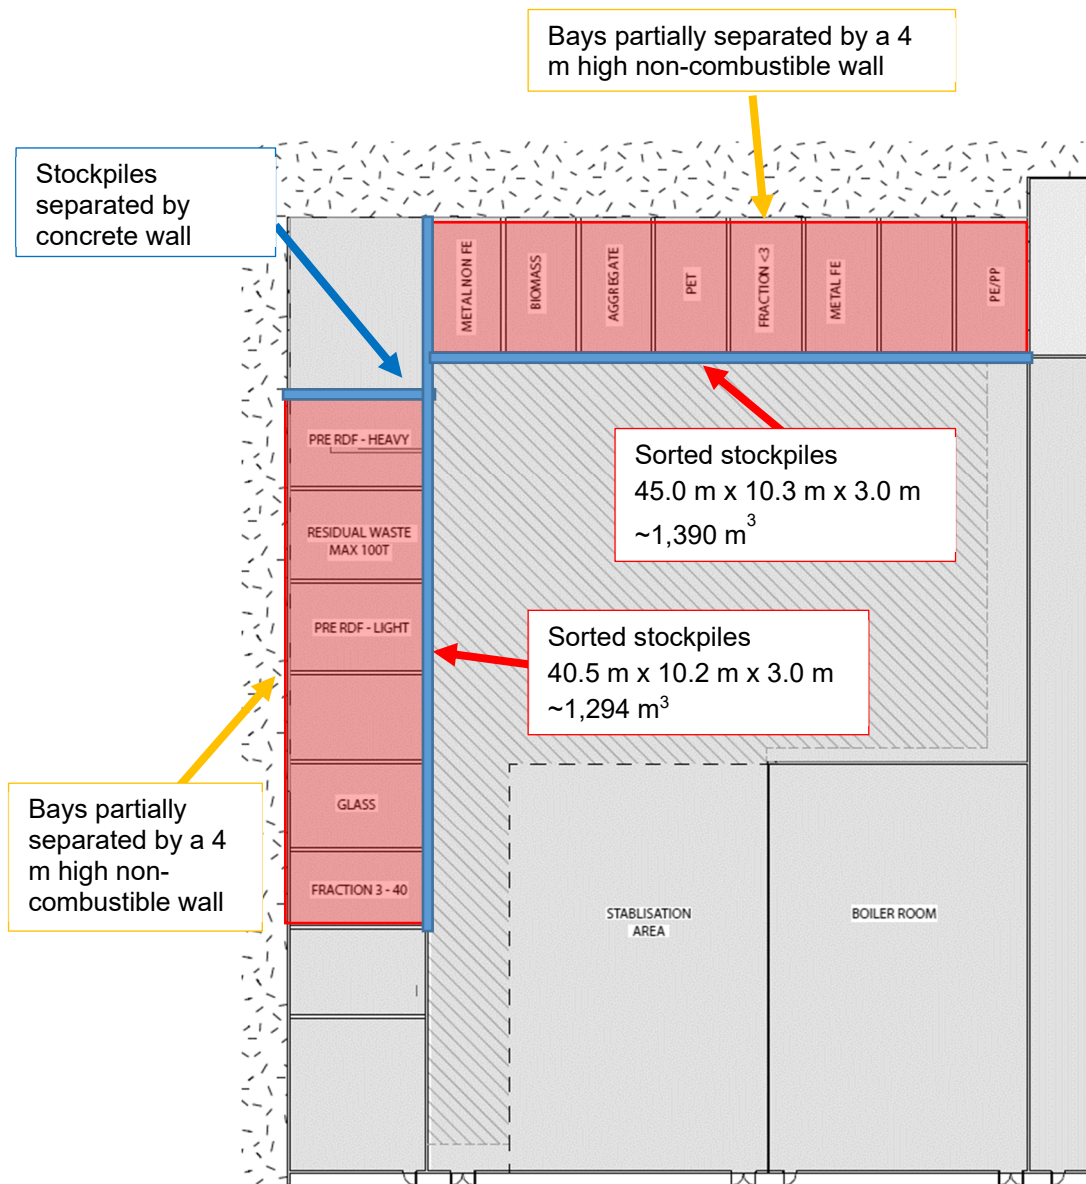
Proposed internal stockpile configuration – sorting hall
